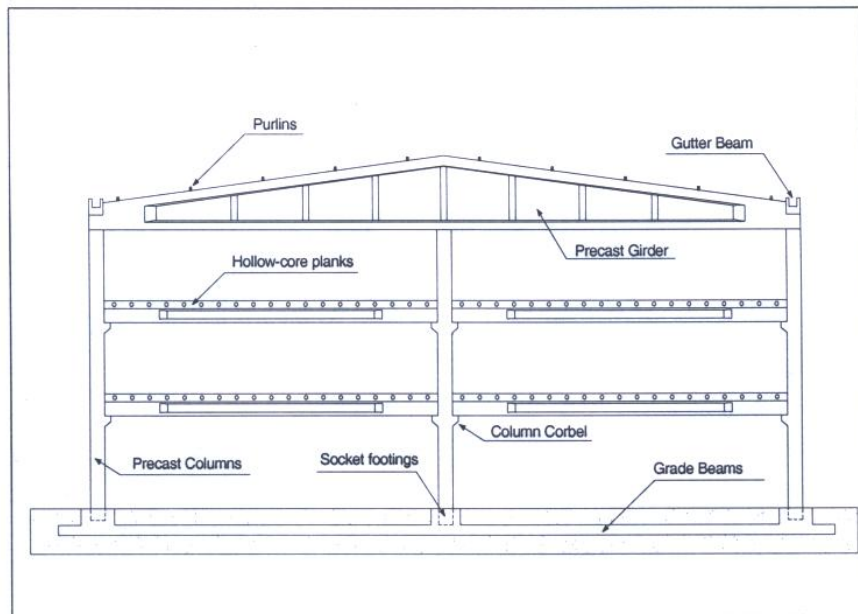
Elevation of a Typical Multi-Story Precast Frame (Posada, 2001)
